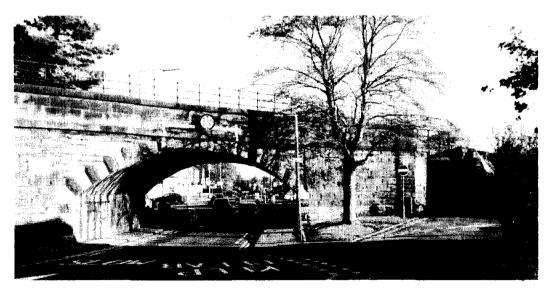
South elevation of railway bridges over Tamworth Road, Sawley
